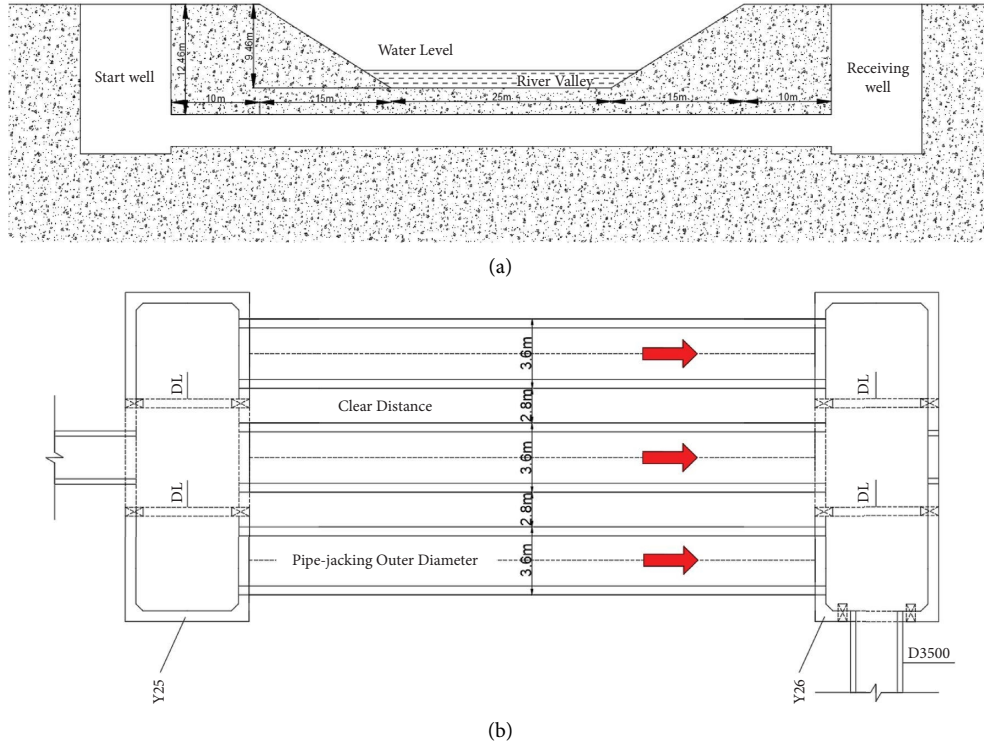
Engineering characteristic drawing of pipe jacking: (a) longitudinal section; (b) schematic plan.
